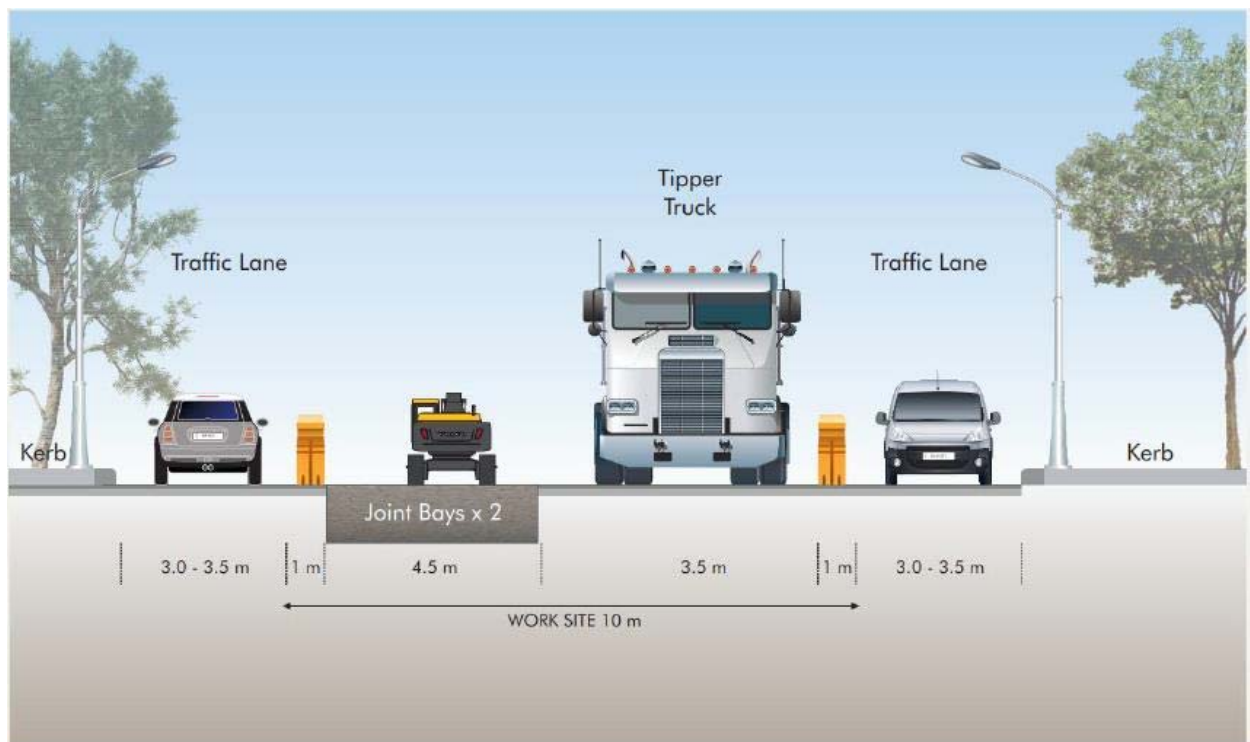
| Construction and Traffic Management for Non-Kerbside Trenching
